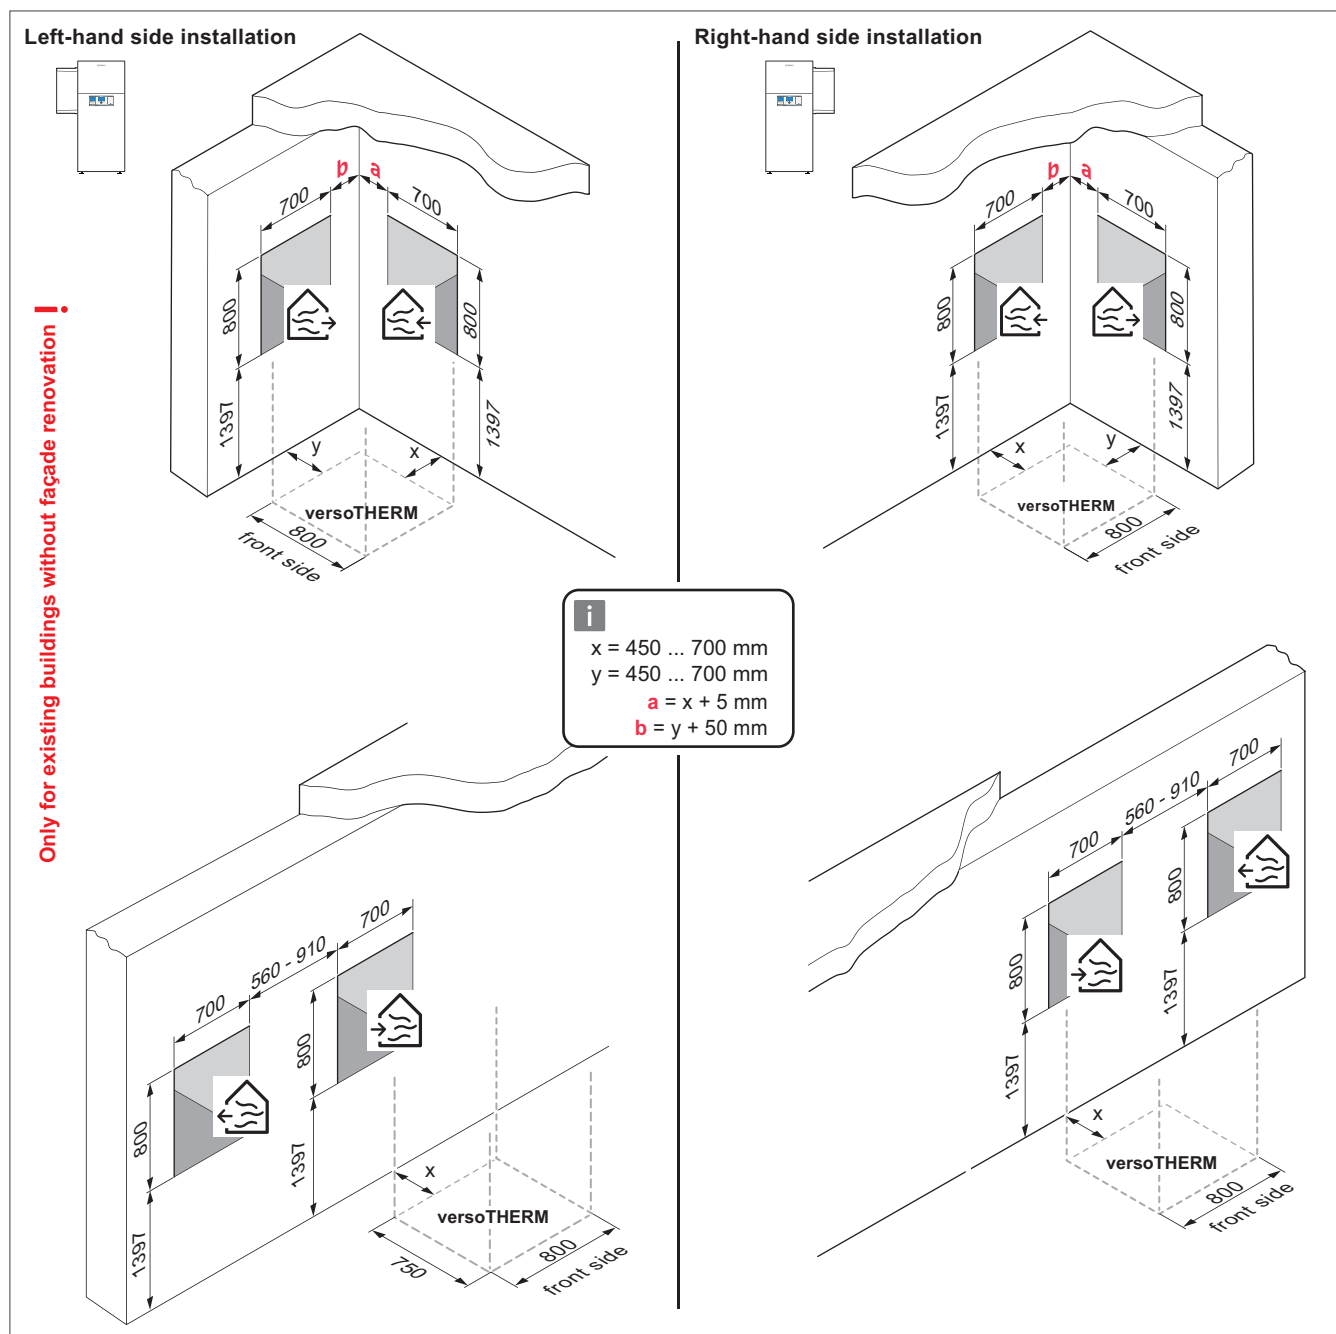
Wall-opening dimensions when using the Vaillant air ducts with a height offset of 410 mm
